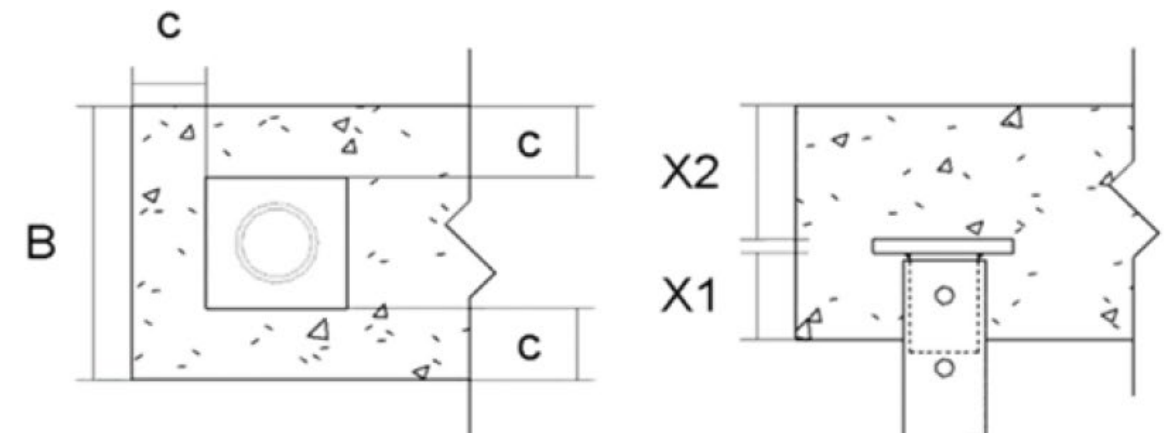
C—DIRECT LOAD BRACKET CONCRETE COVERS DIAGRAM
